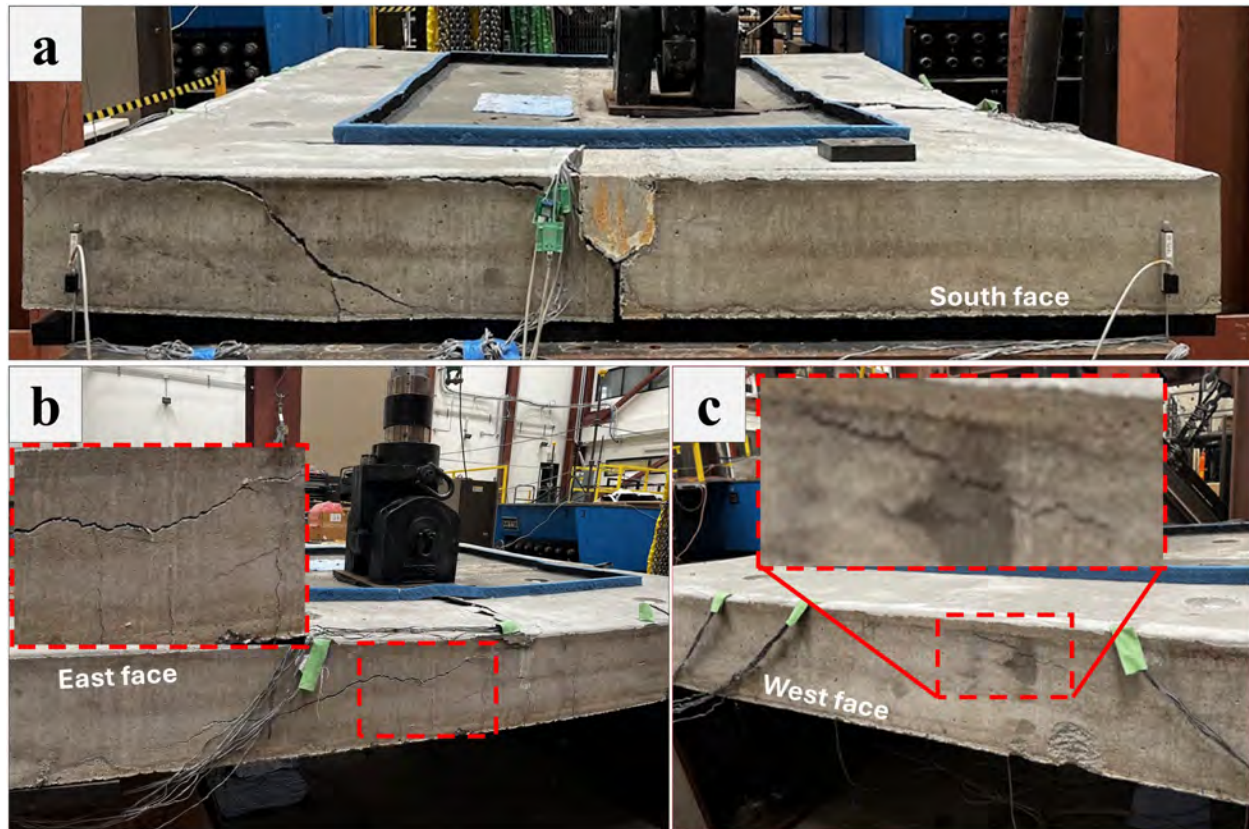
Crack pattern at a) south face b) east face c) west face of PMMA-PC specimen.
